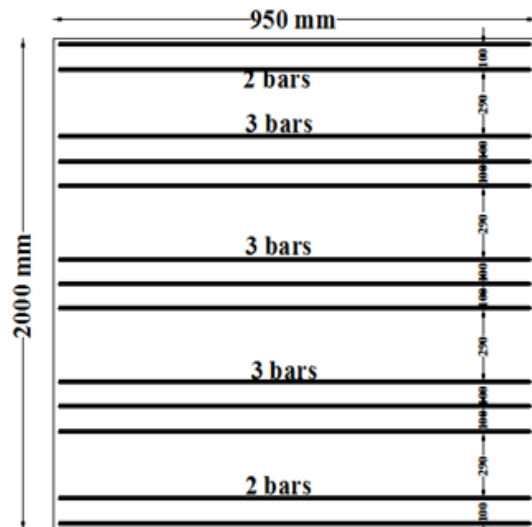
Plan of slab reinforcement distribution for specimen (GIIA-2)
